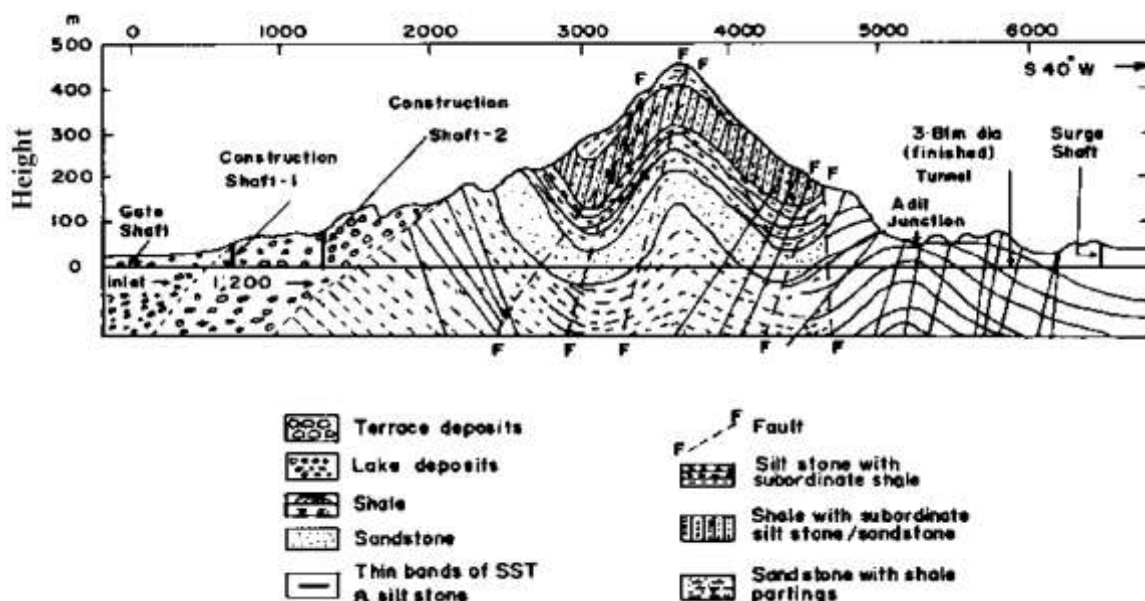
Geological section along Loktak head race tunnel (Malhotra et al., 1982)
